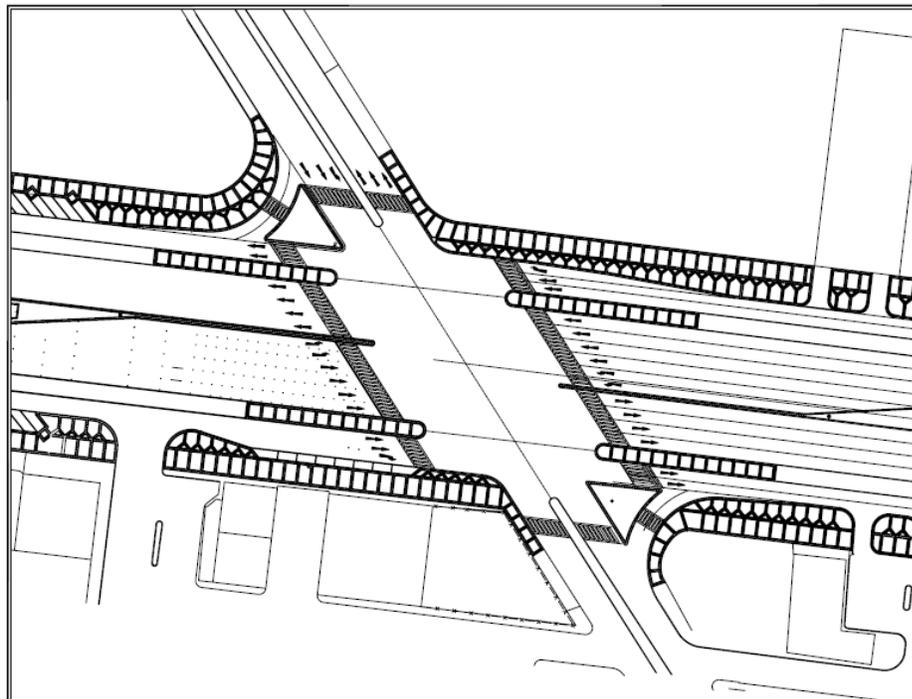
Intersection 1 (Node1) King Abdullah Road–Makkah Street (Olba, 2007)
